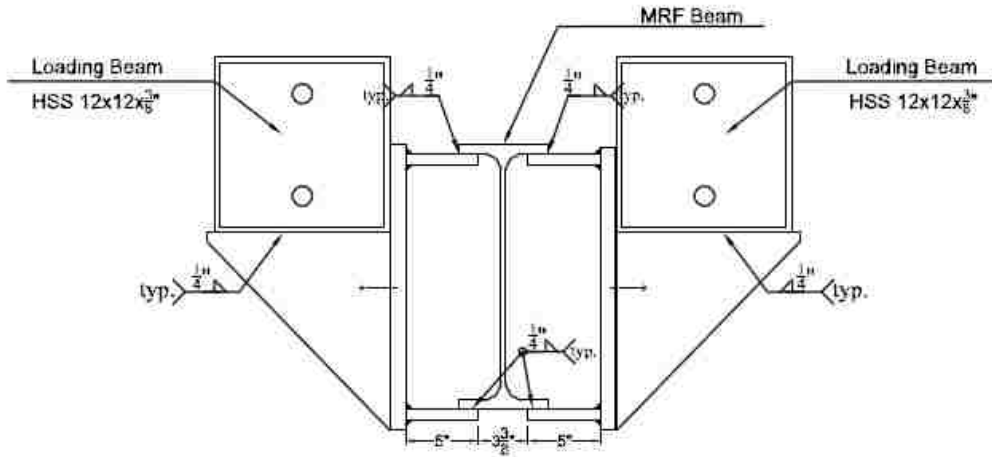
MRF Out-of-Plane Bracing and Loading Beam Shelves
